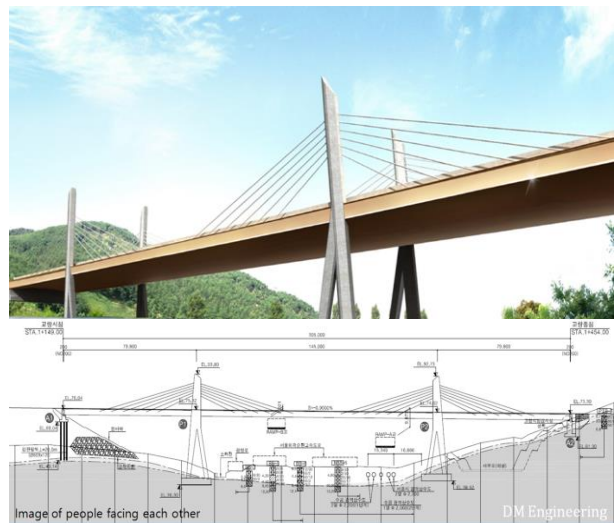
Extra-dosed bridge having steel girder for Kwang-am bridge.
